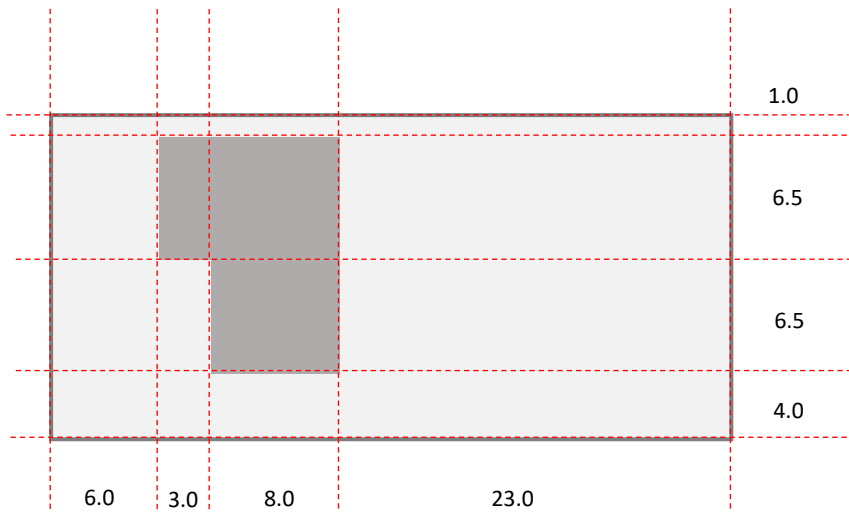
Typical 18m x 40m Ruahine Street lot and building footprint (dimensions in metres).
